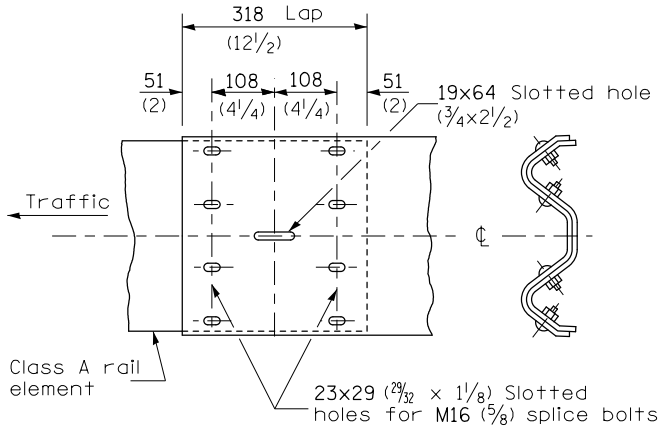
1/2" STEEL PLATE BEAM GUARDRAIL
